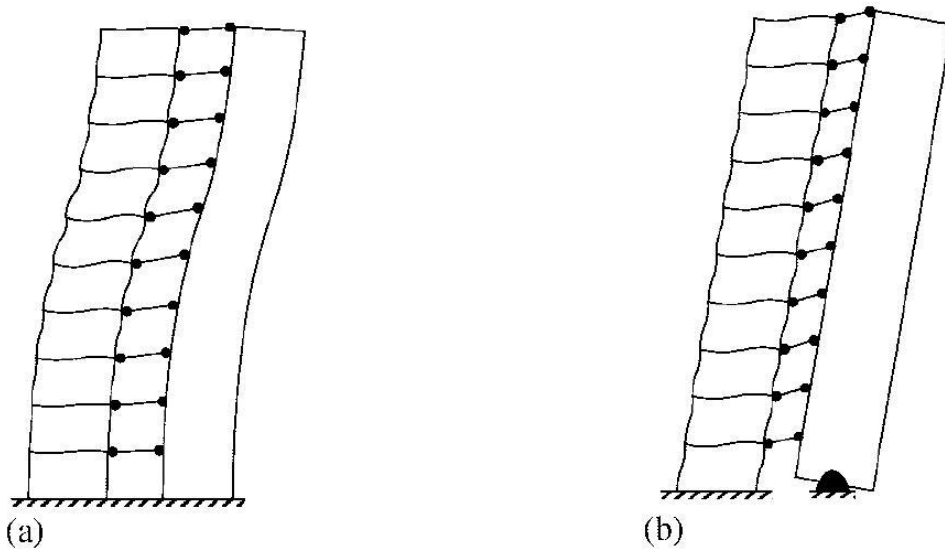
Typical elastic deflected shape of dual systems: (a) fixed wall; and (b) hinged wall (Krawinkler et al. 2003b)
